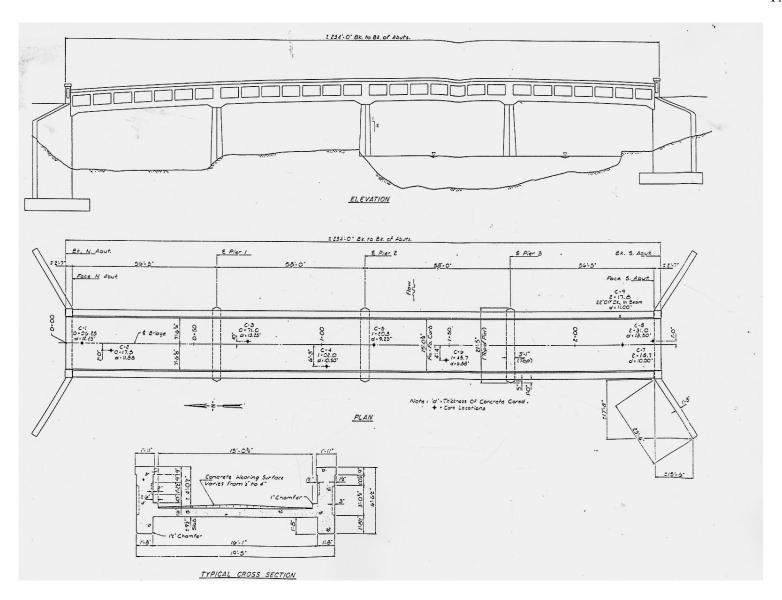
Elevation, plan, and sectional views of the Allerton Park Sangamon River Bridge (Hanson Engineers, Inc. 1993).
